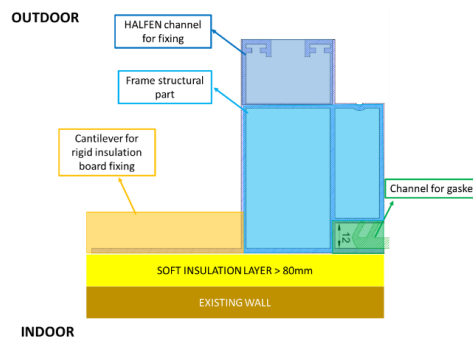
Detail of the macro-panel aluminium frame in its main parts and functionalities (drawing not to scale)
